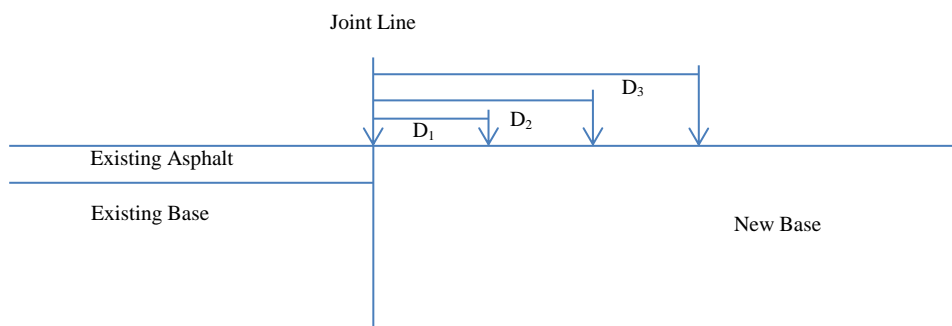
Diagram. New Widening using Vertical Longitudinal Joint
